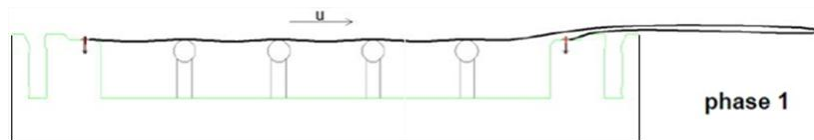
Cross-sections bottom recess, phase 1 of deflation (Figure Jongeling + Rövekamp).
